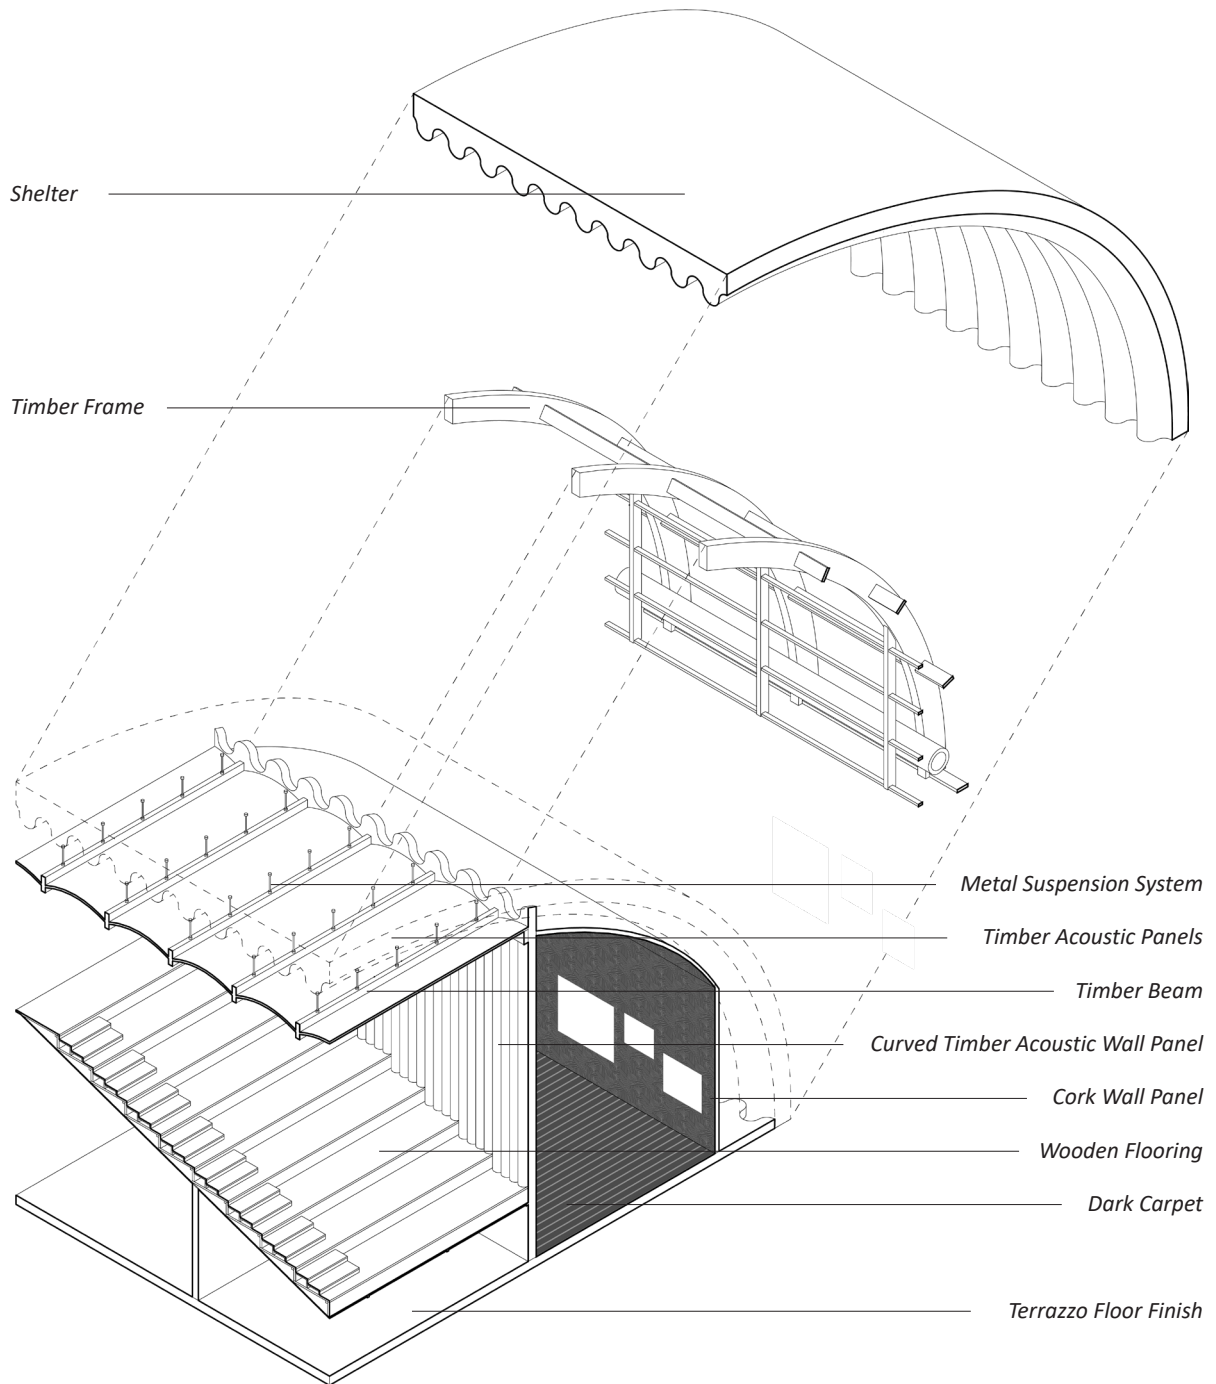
Exploded Axonometric View of the Lecture Hall
